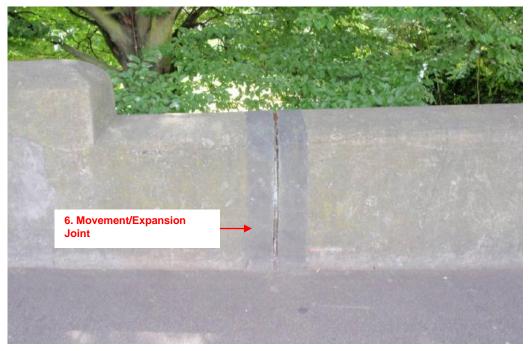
Widmore Road Retaining Wall – Expansion Joint
